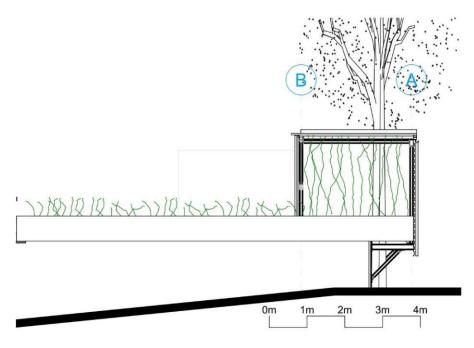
Elevation South M1:100. Plant containers will be the guardrail to this side in the future
